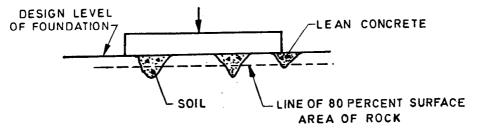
FOUNDATION ON UNDULATING ROCK SURFACE
